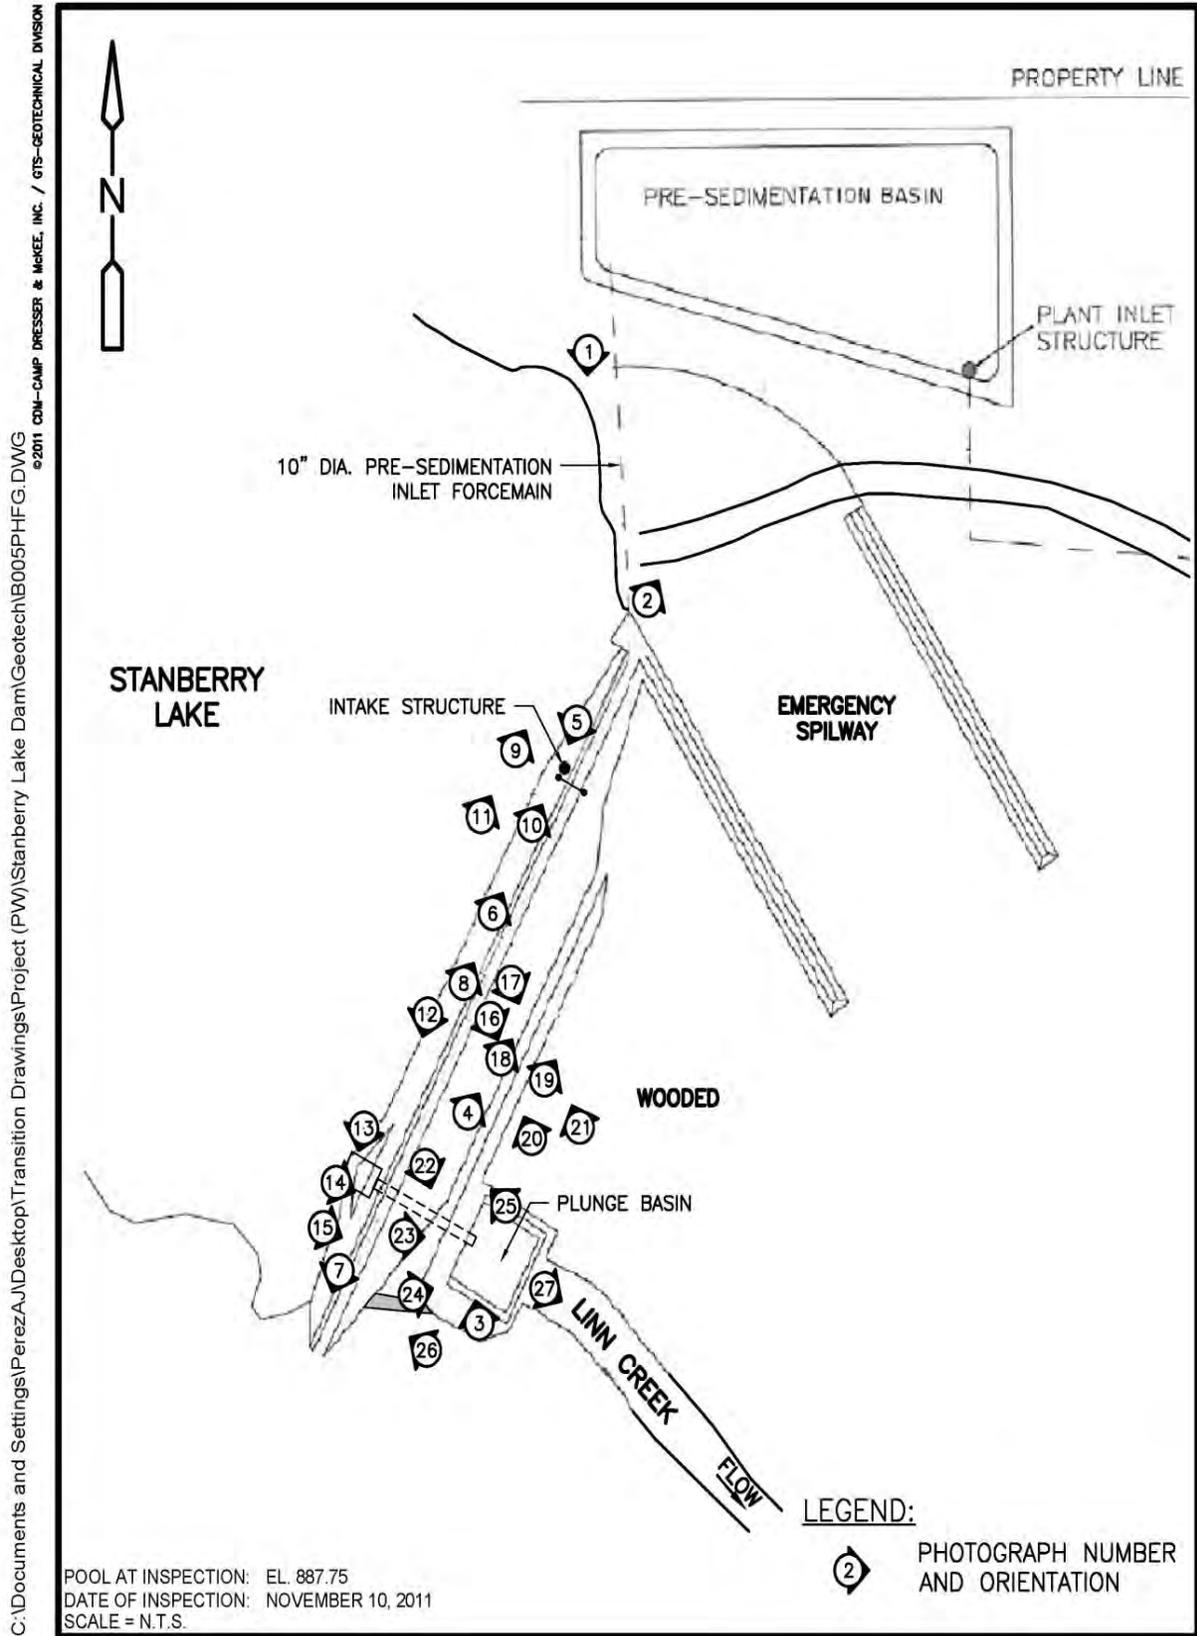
Photograph Locations Plan - Stanberry Lake Dam
